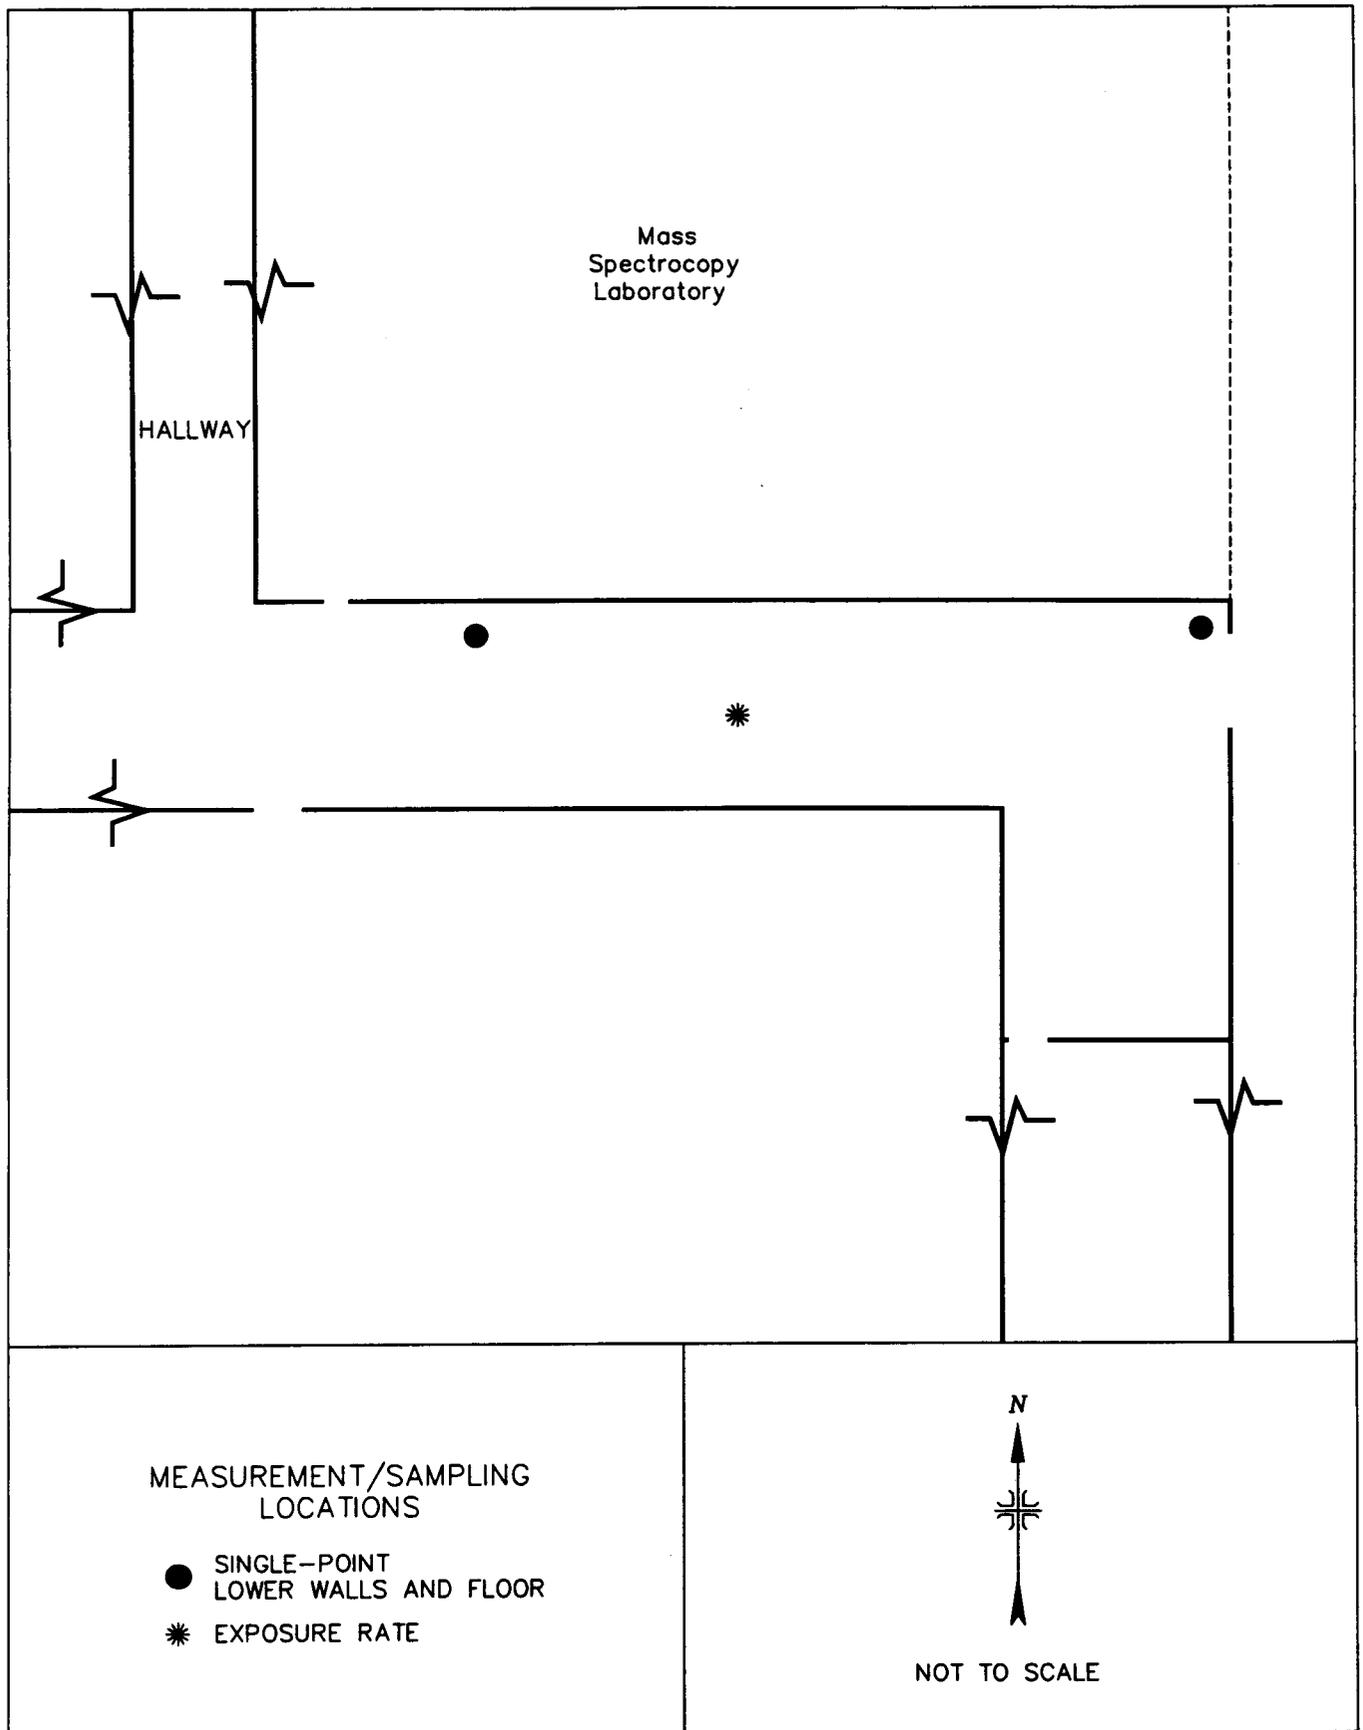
Building 104, South Hallway – Measurement and Sampling Locations
